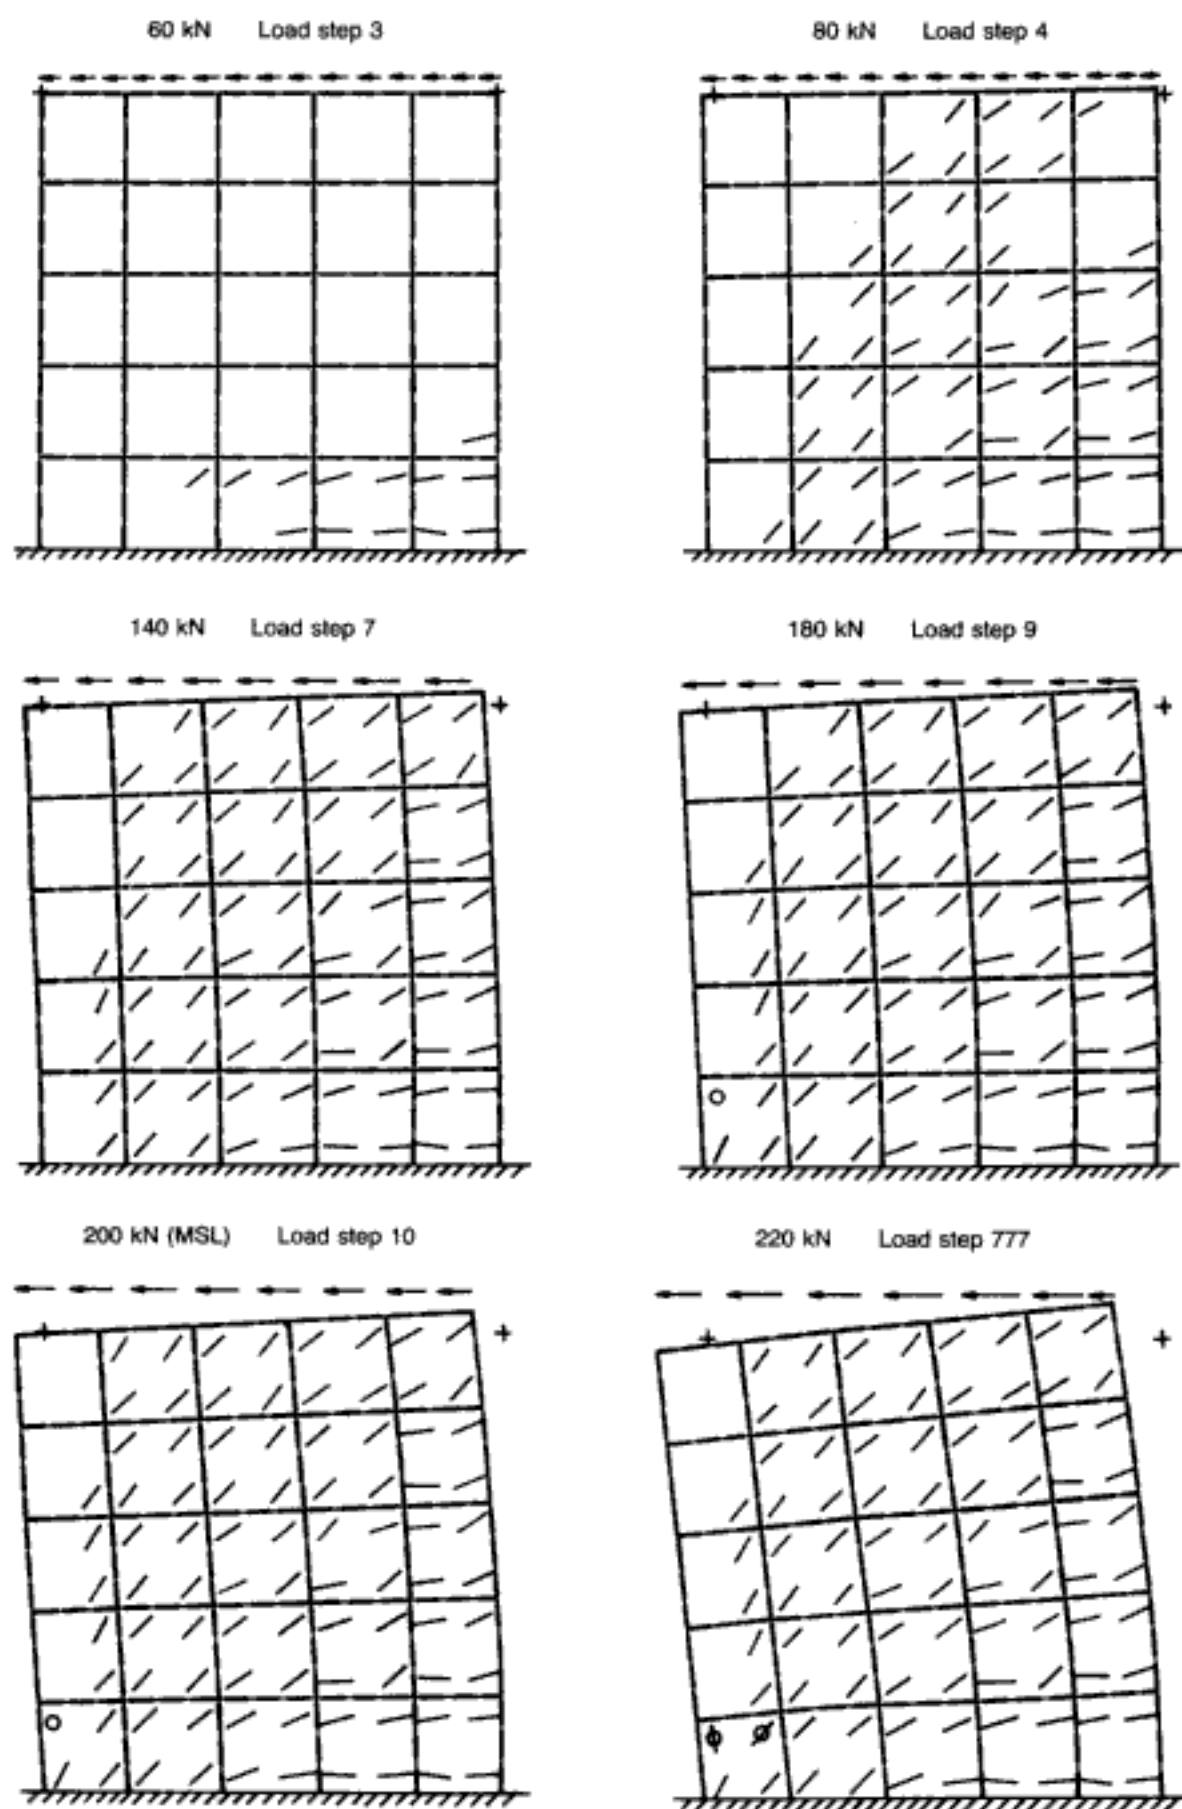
RC structural wall failing in flexure (CS7). Crack patterns and deformed shapes ($D.M. = 20$) at various load stages¹⁶⁵
